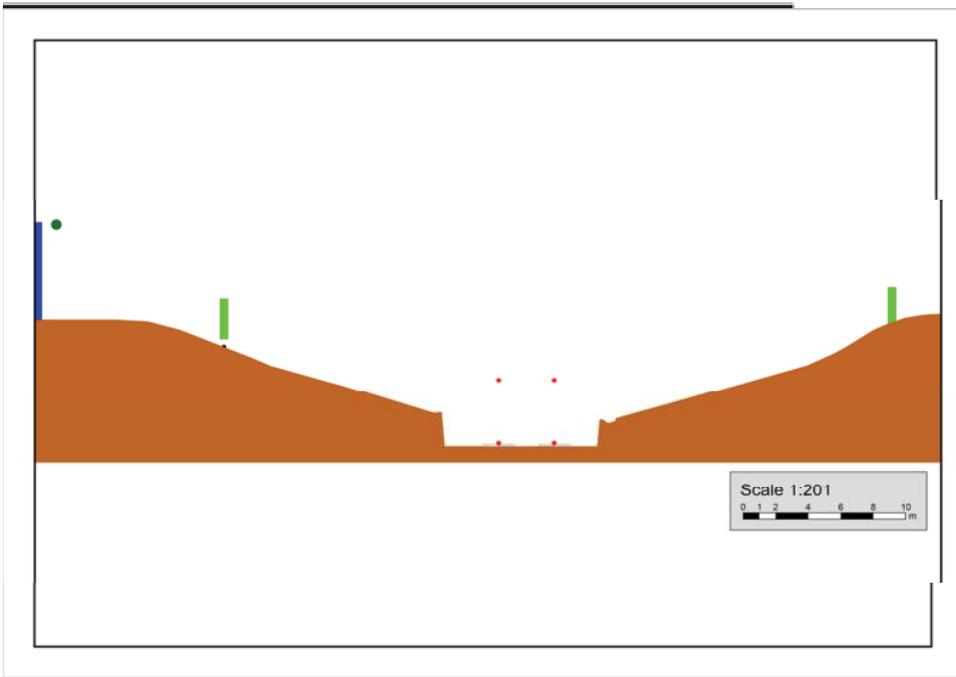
Cross Section at SoA 9, Upper Close, 1 Godstow Road
